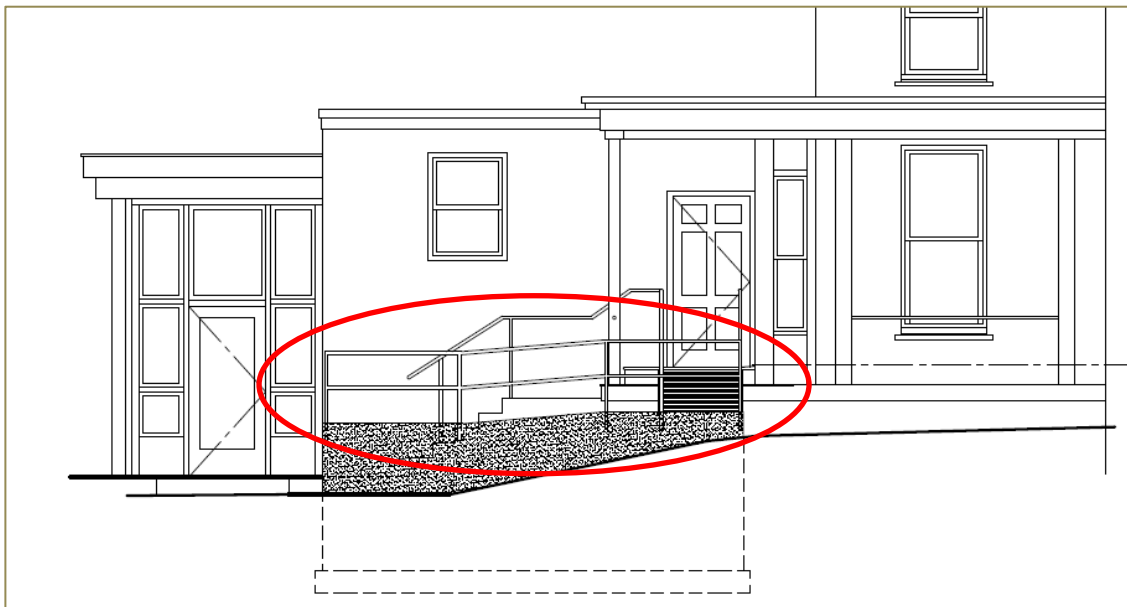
Image of the proposed east elevation submitted by the applicant. The proposed railing for the ramp is circled in red.
